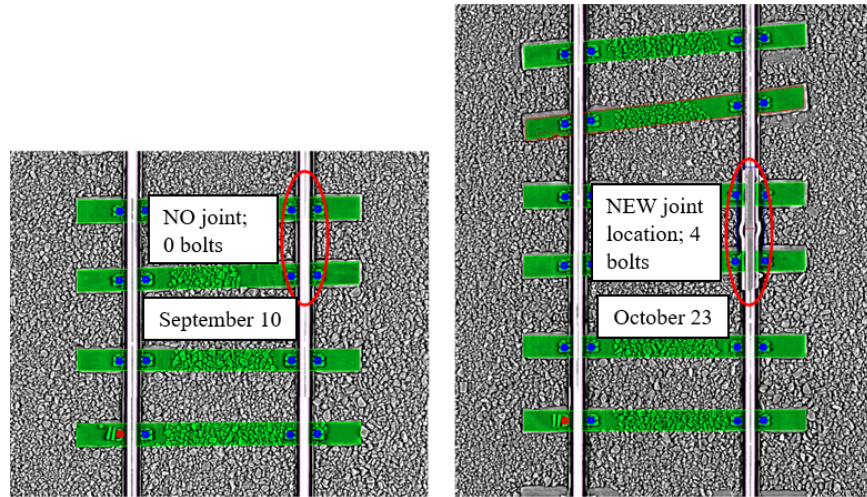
No Joint Bars (Left) and 1 Joint Bar (Right)
